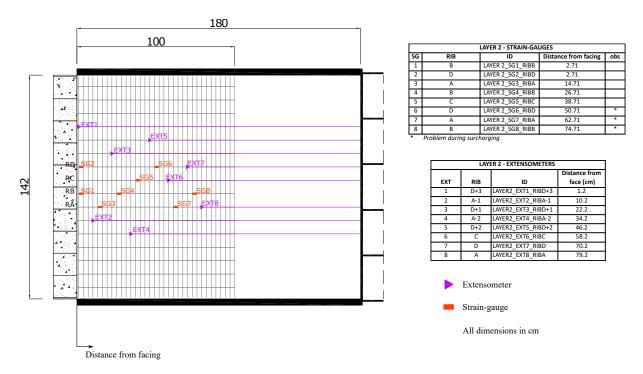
Extensioneter and strain-gauge locations for layer 2, with distances of the measuring points from the facing summarized at the right tables (See Figure 5.25 for reinforcement layer elevations).
